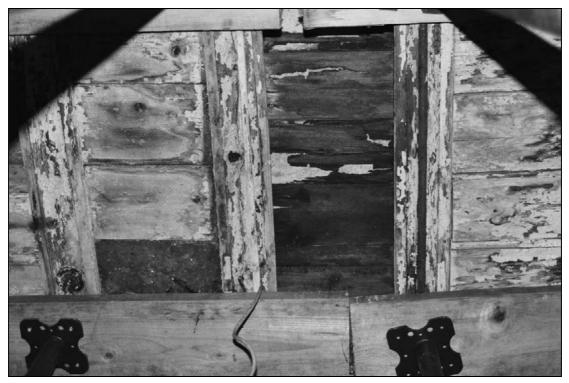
Detail of ceiling construction, G17 south range (film 22.5)
